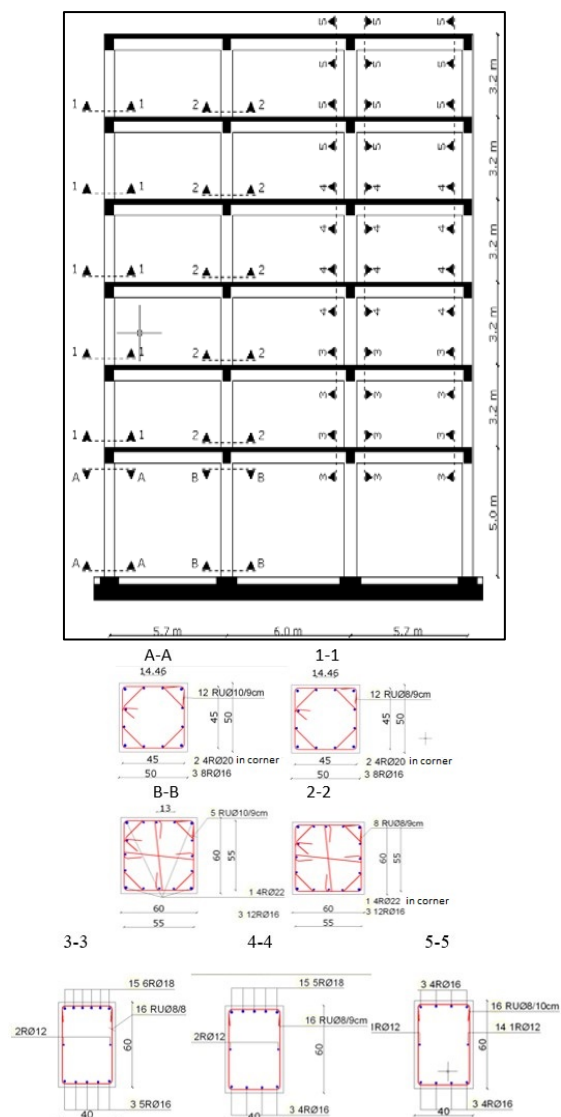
Reinforcement of beams and columns for frame 2-3-B-C
